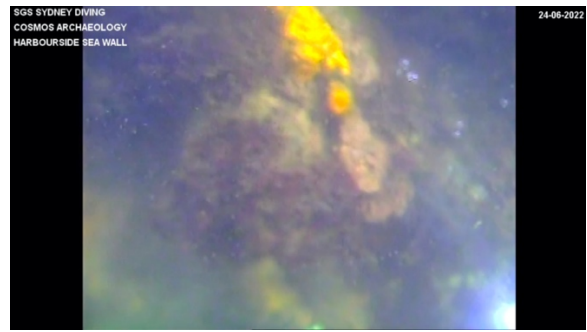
Possible damaged drainage pipe. (Image 220624_Stone seawall dilapidation_4, 02:49)
